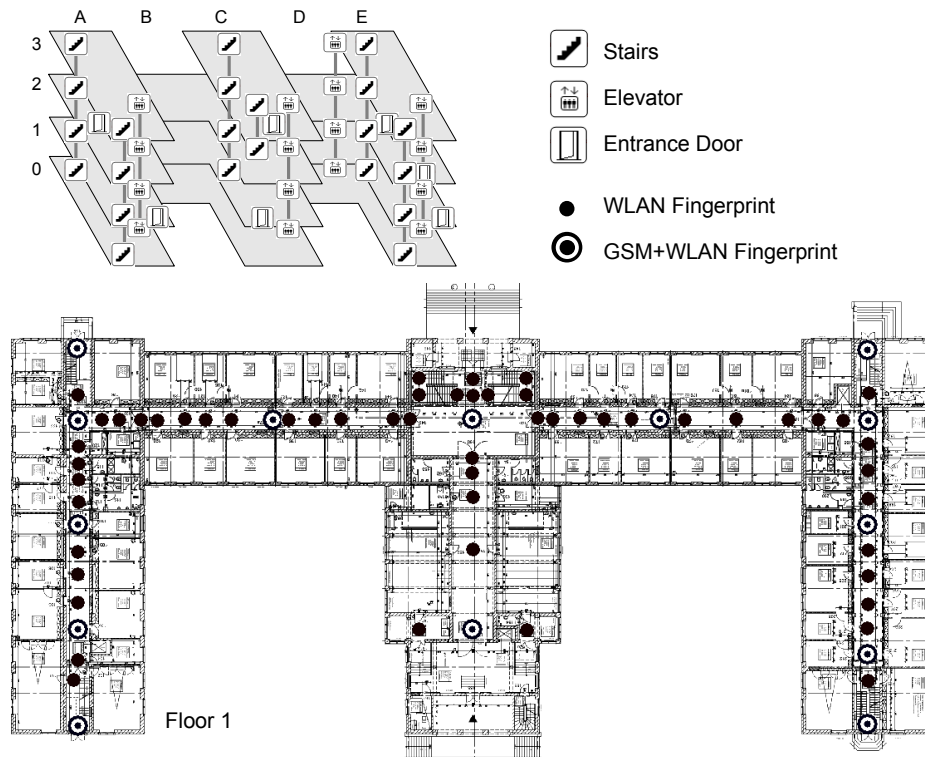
Layout of the Piloty Building and Fingerprint Locations for One Floor
